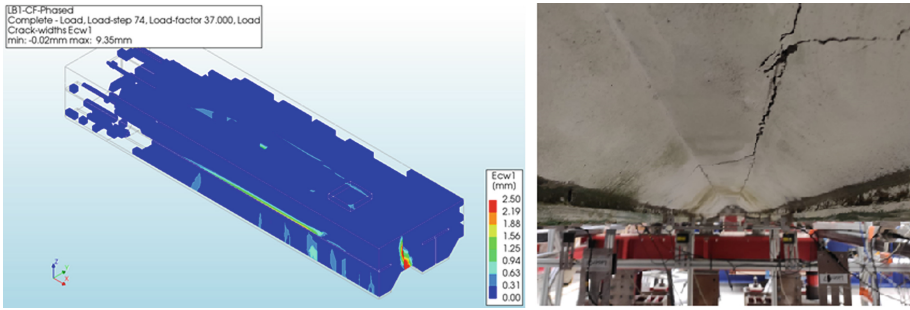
Crack Pattern LB1. Left: FE isometric view. Right: Experimental bottom view
